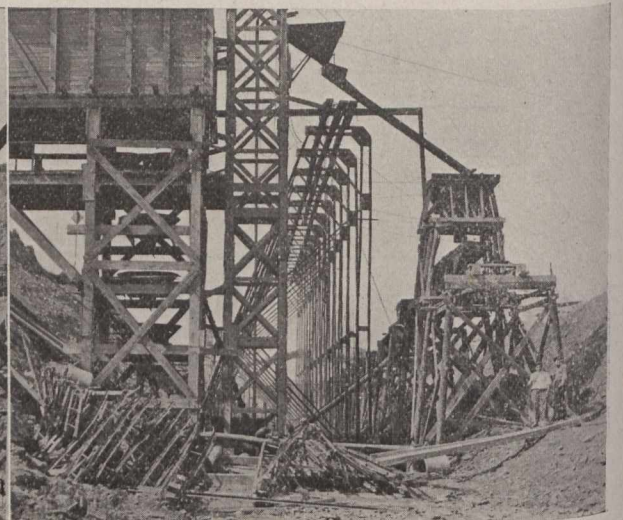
Part of the Concreting Plant at the South End of the Retaining Wall.
